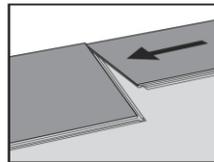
Second plank, first row place or tap this plank gently and tight to the short end of the first one. Angle or drop short end into place, this may require a tapping block to close the short end joint.
